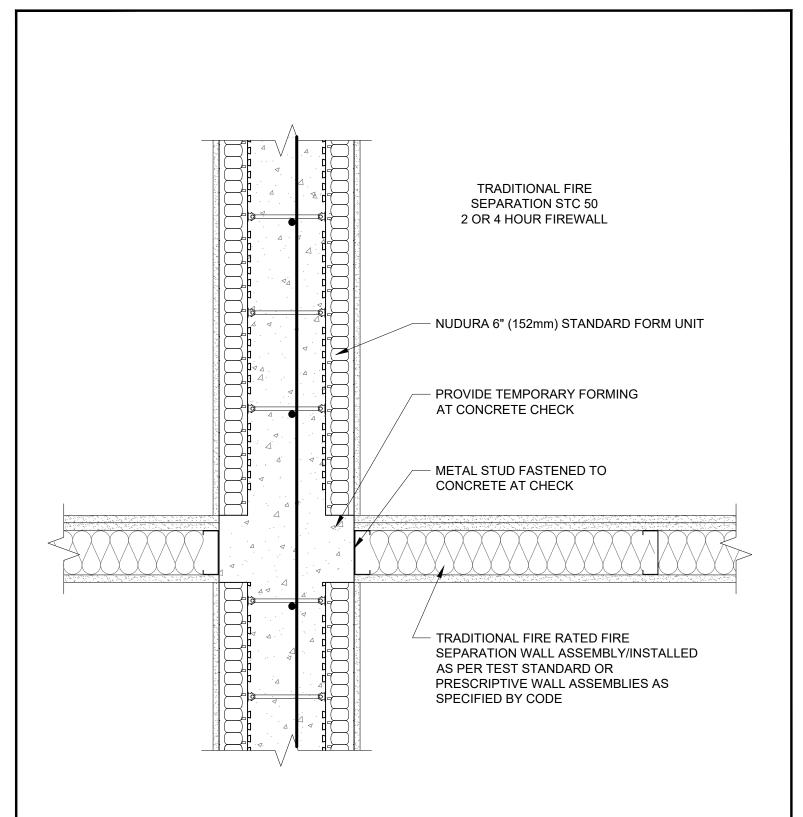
" (152mm) Standard Form Unit STC/Fire Wall, Firewall Projection Through Roof, 2 or 4 Hour Firewall			Fi
